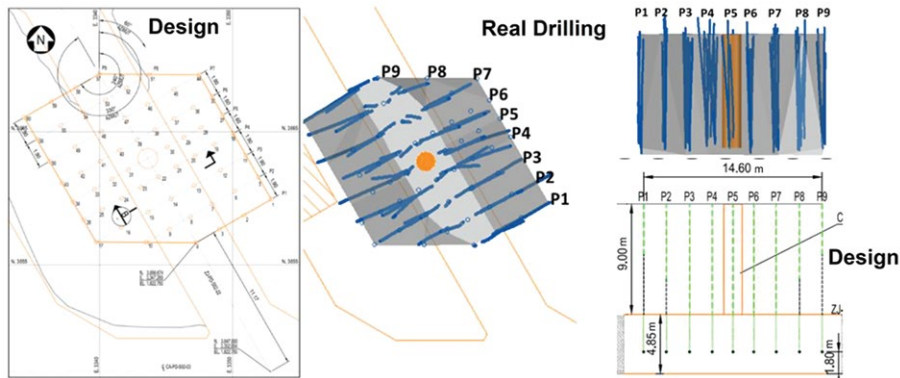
3D plan and section view of actual drilling vs theoretical drilling (after Paredes and Rodriguez, 2018)
